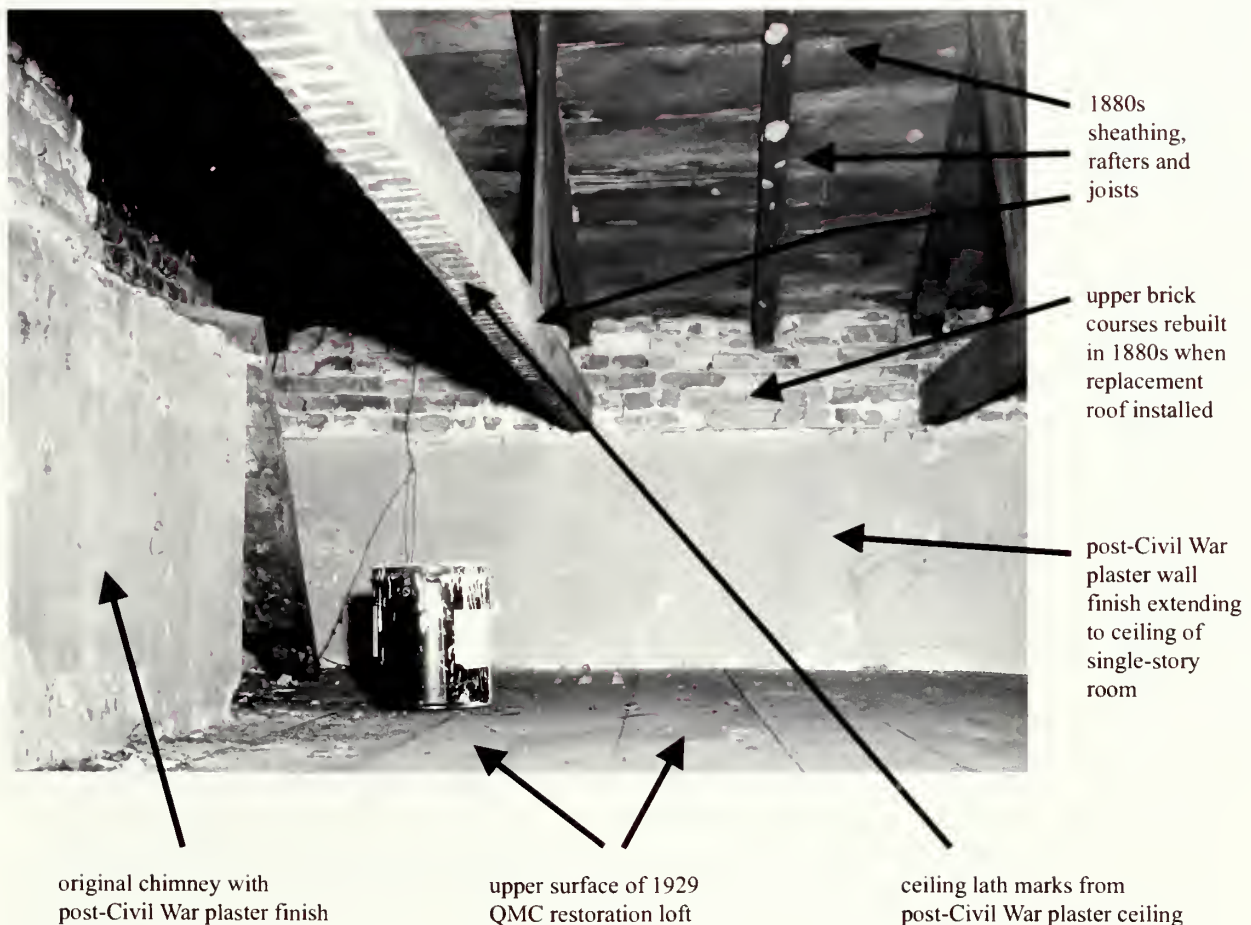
South Dependency, east room, 1957, space above QMC loft. When the QMC installed a loft in 1929, they closed off this upper area from view. Lath marks on the 1885 roof joists indicate the presence of a finished ceiling and layers of plaster date from the time after the Civil War when this space was a single level room. The roof system and portions of the historic plaster survive today above the west room loft.
